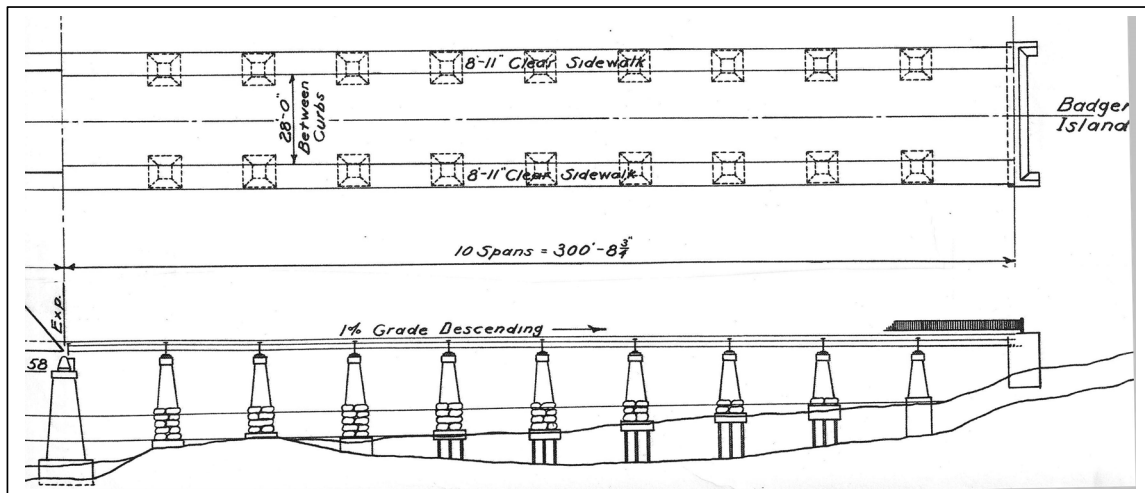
Badgers Island Approach Span (NHDOT) [Larger scale plan at Tab O]
